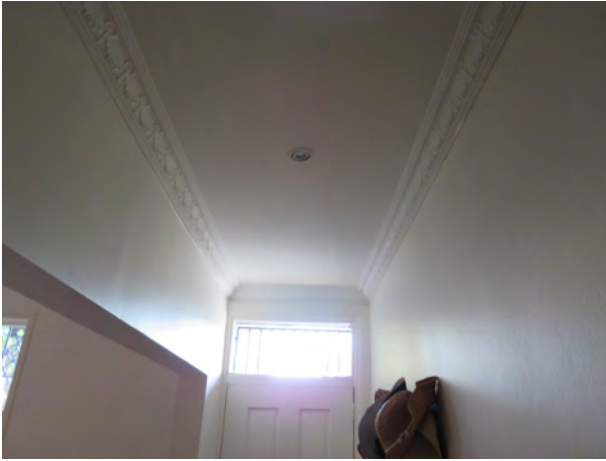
Later ceiling to front hall of 92 Brougham Street.
